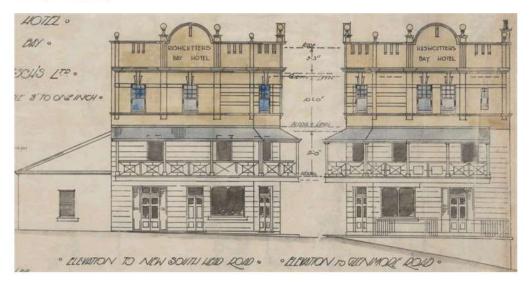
Detail of New South Head Road (L) and Glenmore Road (R) elevations, "Rushcutter [sic] Bay Hotel, New South Head Road, Paddington, Design of additions and alterations, basement and ground floor plan, front elevation, elevation to New South Head Road and section, Applicant/owner, Reschs Limited, Architect M Rigden, 70 Hunter Street, Sydney, Signed 30 March 1911" (Source: State Records and Archives Authority
